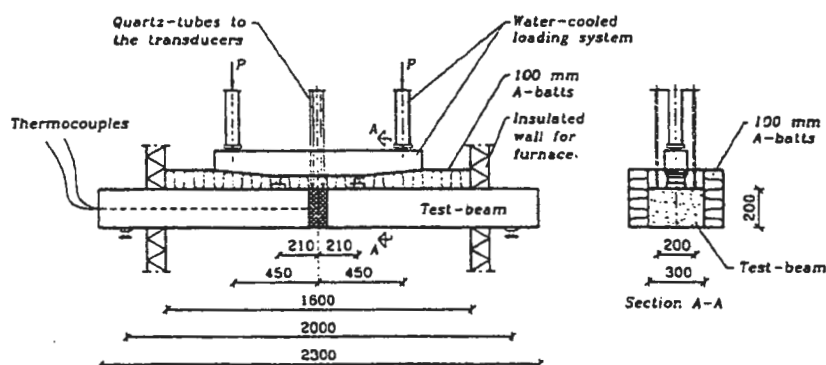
Test setup for fire testing of beams. Measurements in mm.
